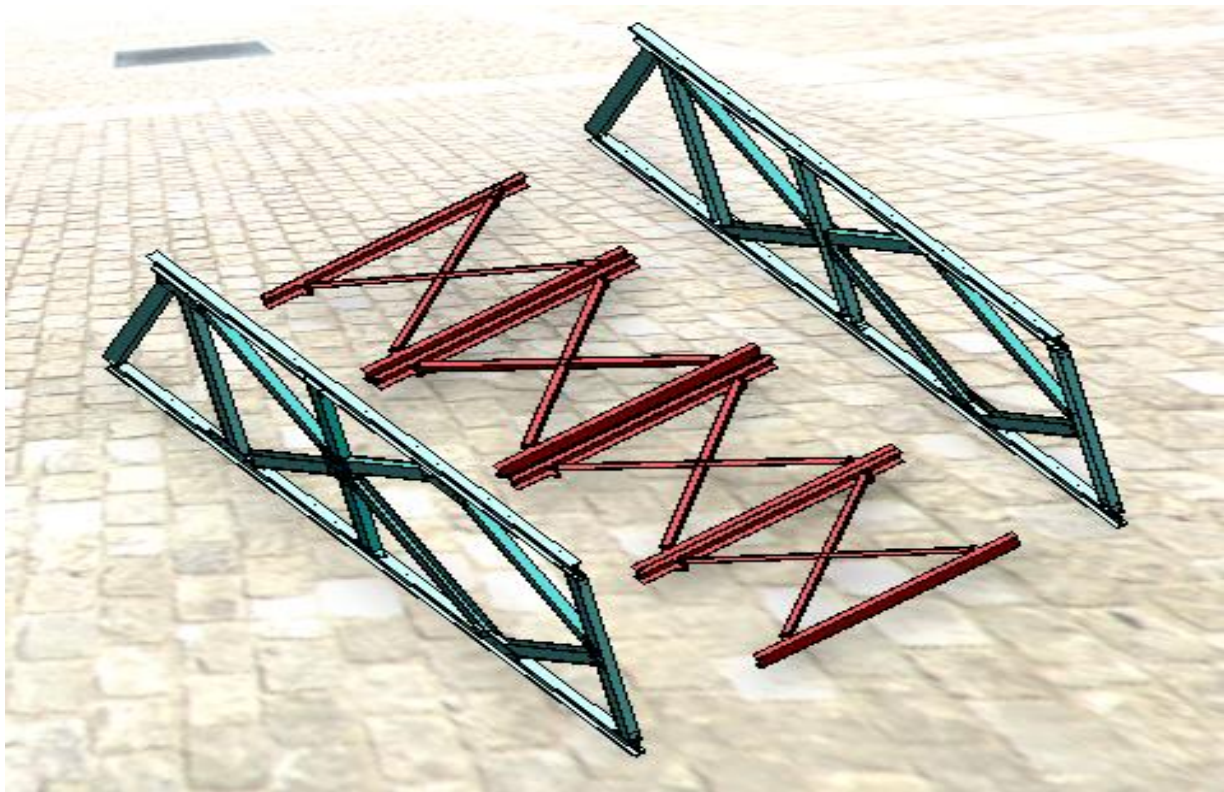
Base panel and two side panels used to construct end module (ML-A)
